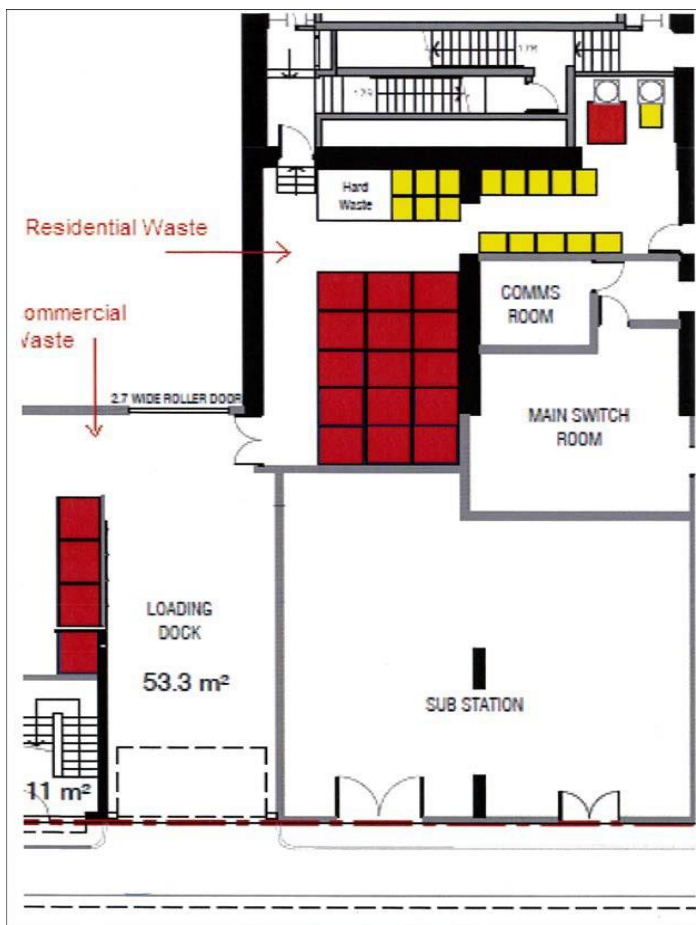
Example scaled waste management plan drawing of generic residential bin room.
